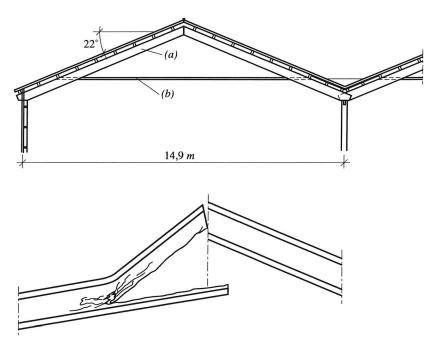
Failure in a glued laminated timber structure due to bad gluing. Section (top) and sketch of the failure (bottom); (a) glulam, (b) tension bar.
